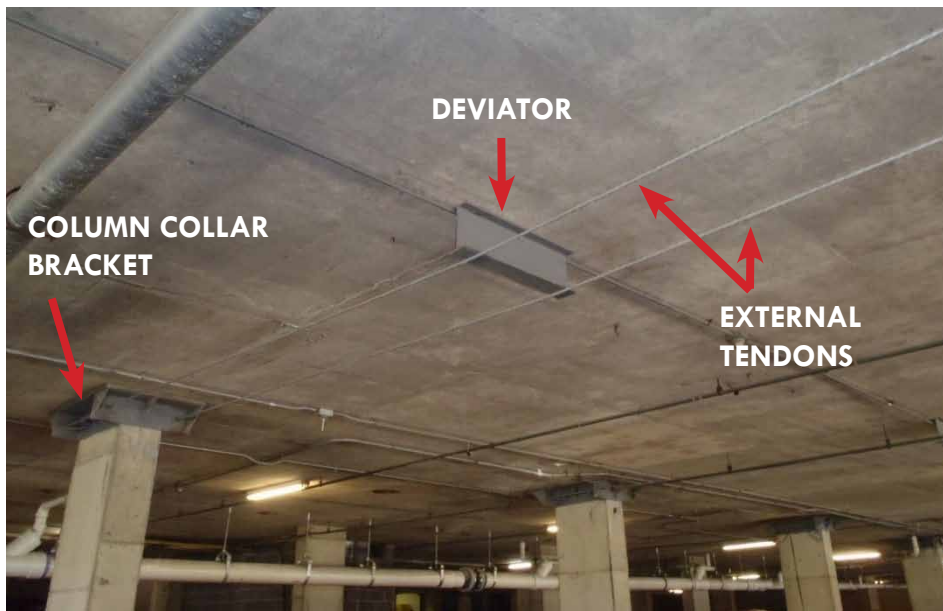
Steel column collar brackets and intermediary deviators were installed.
